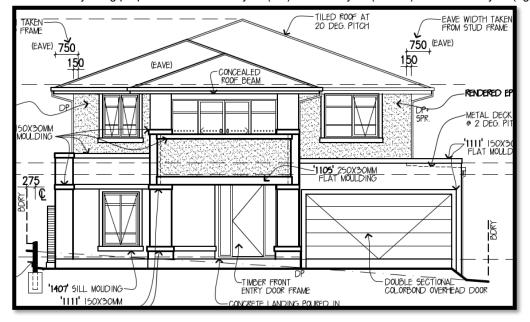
Proposed dwelling at No. 36 Olive Street as viewed from Olive Street.
